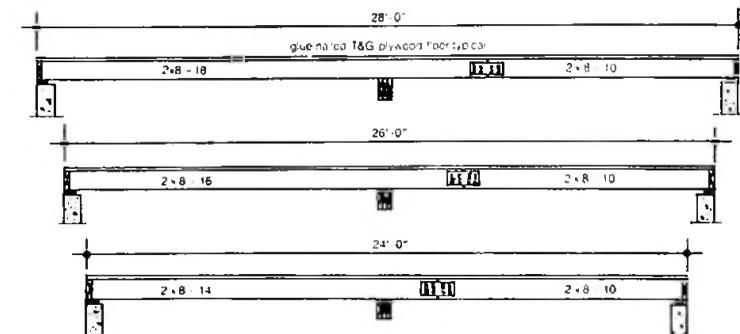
Off-center spliced joist designs span further than simple joists of the same dimension.
